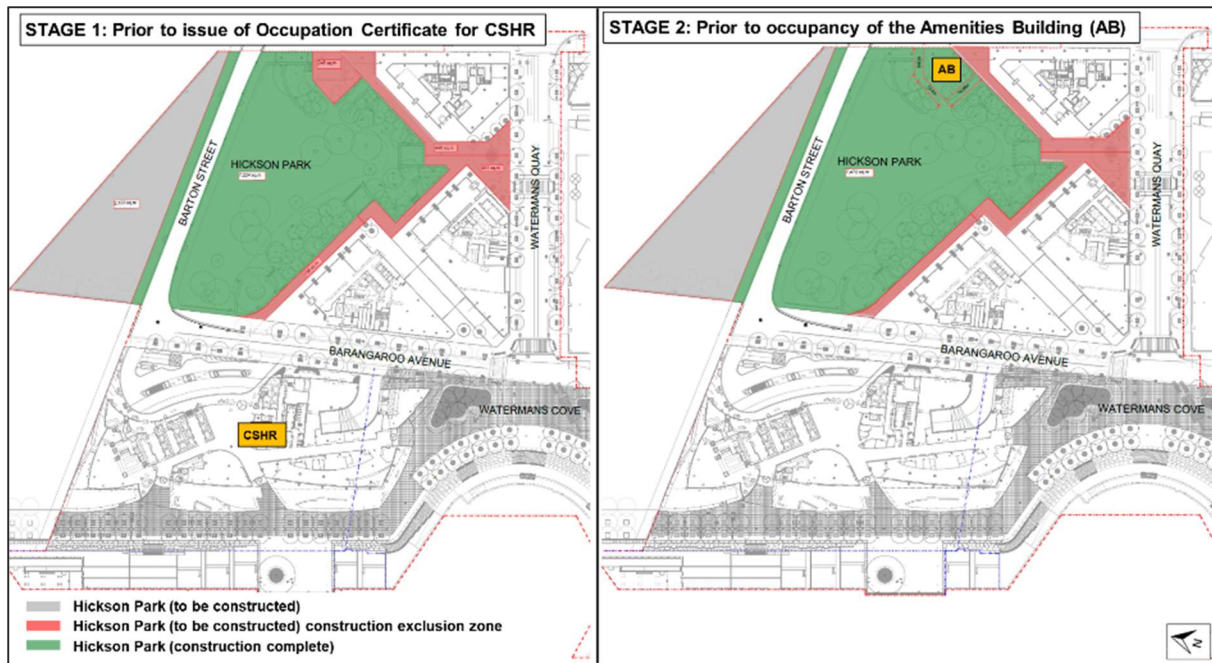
| Proposed Hickson Park construction Stages 1 and 2 (Base source: Proponent's EA)
